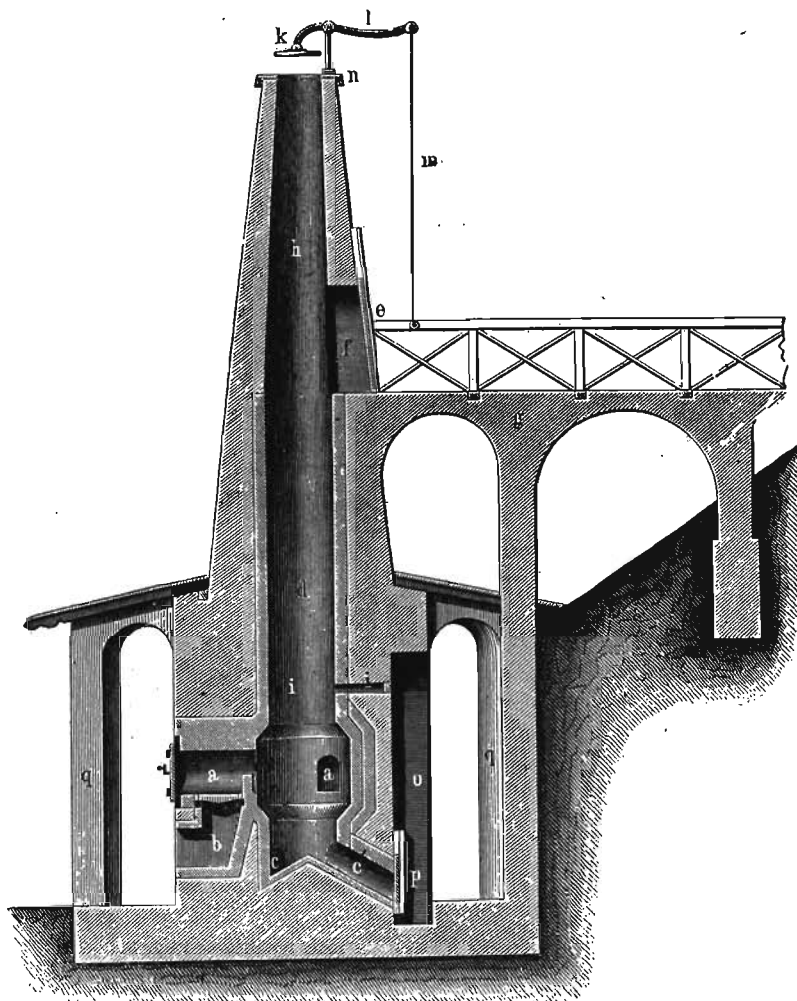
Cross section of one type of kiln for burning hydraulic gypsum (Estrick). After Von Waldegg.
